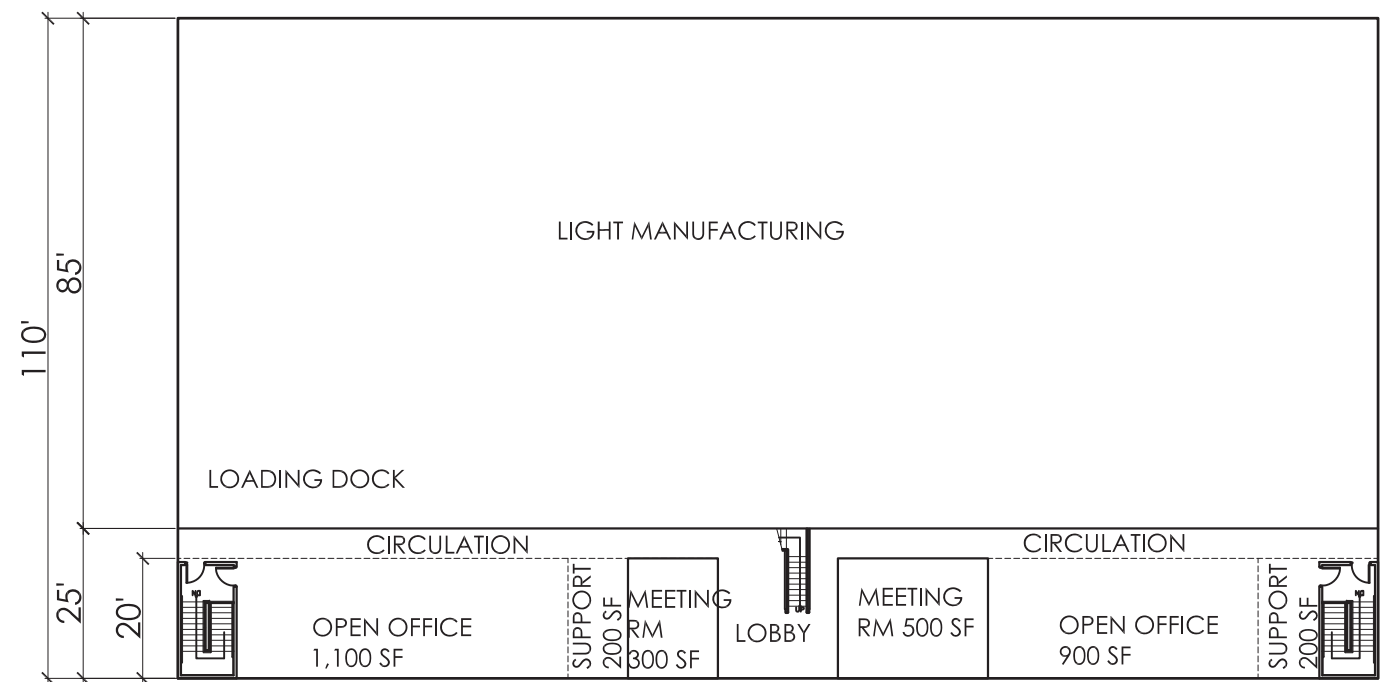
Net Zero ready office/manufacturing second floor plan
